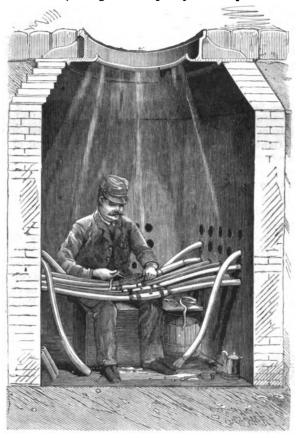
SPLICING WIRES AND CONNECTING CABLES.
